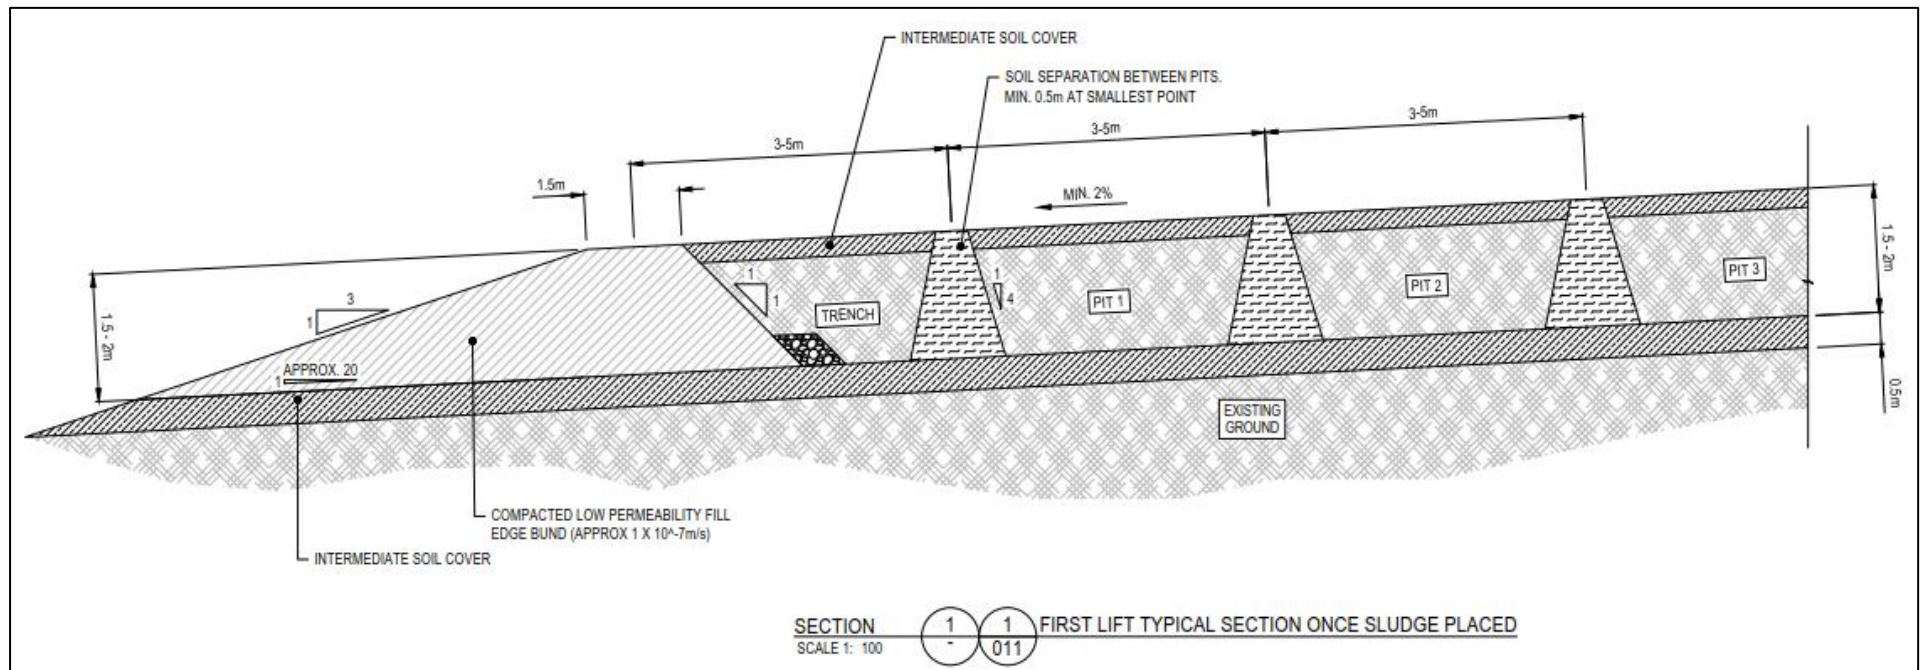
Typical cross section of 'lift one' of the sludge disposal facility.
